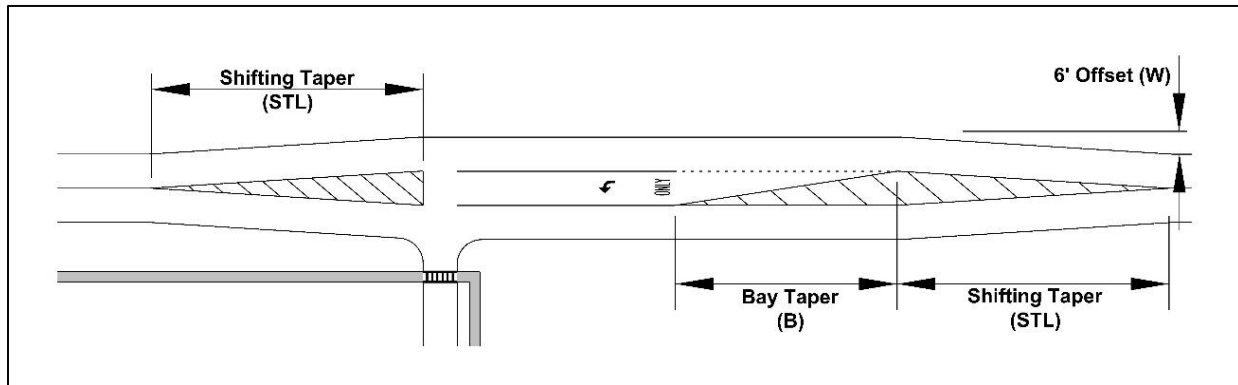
Shifting Taper Length – Symmetrical Widening
